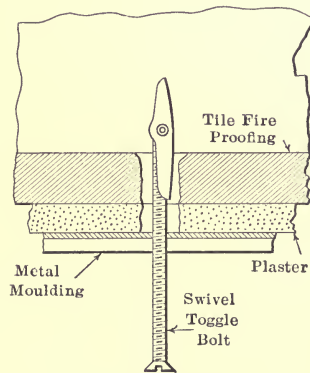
TOGGLE BOLT BEING INSERTED.
